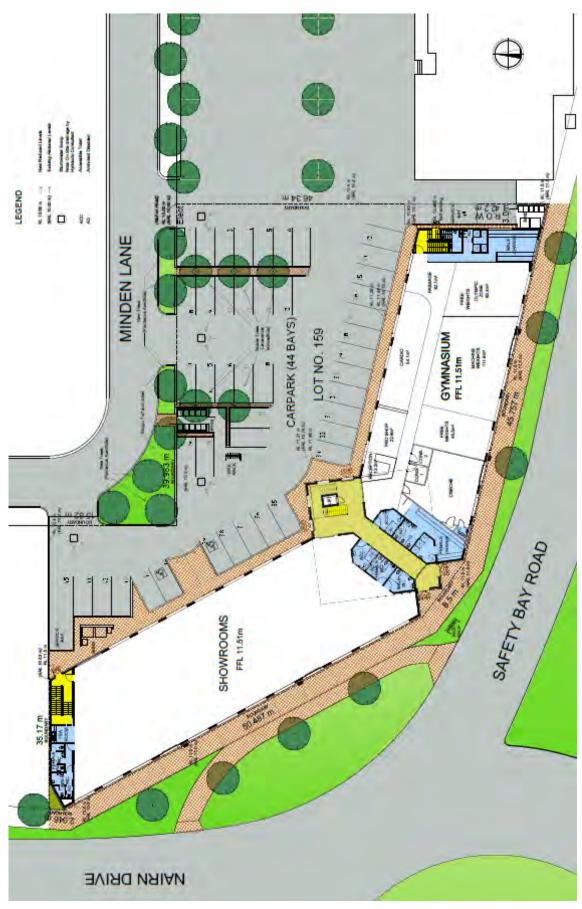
Second Site and Ground Floor Plan (23.1.2015)
